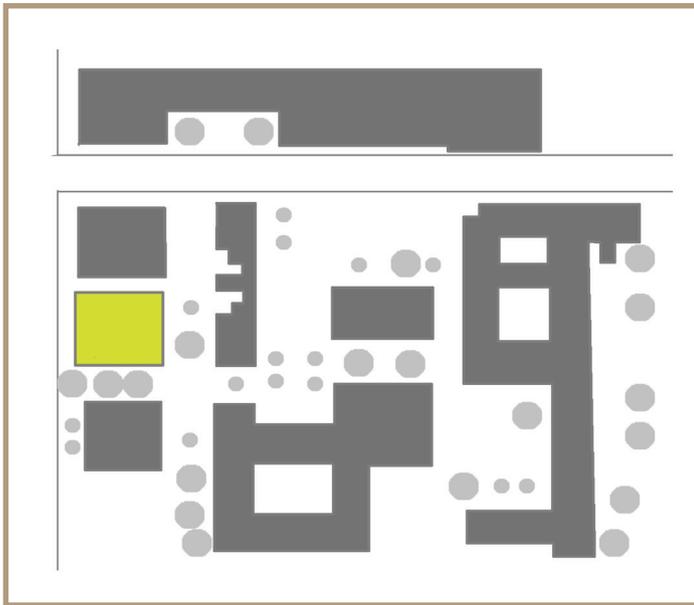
Diagrammatic site context showing adjacent buildings and streets (Author, 2011).
